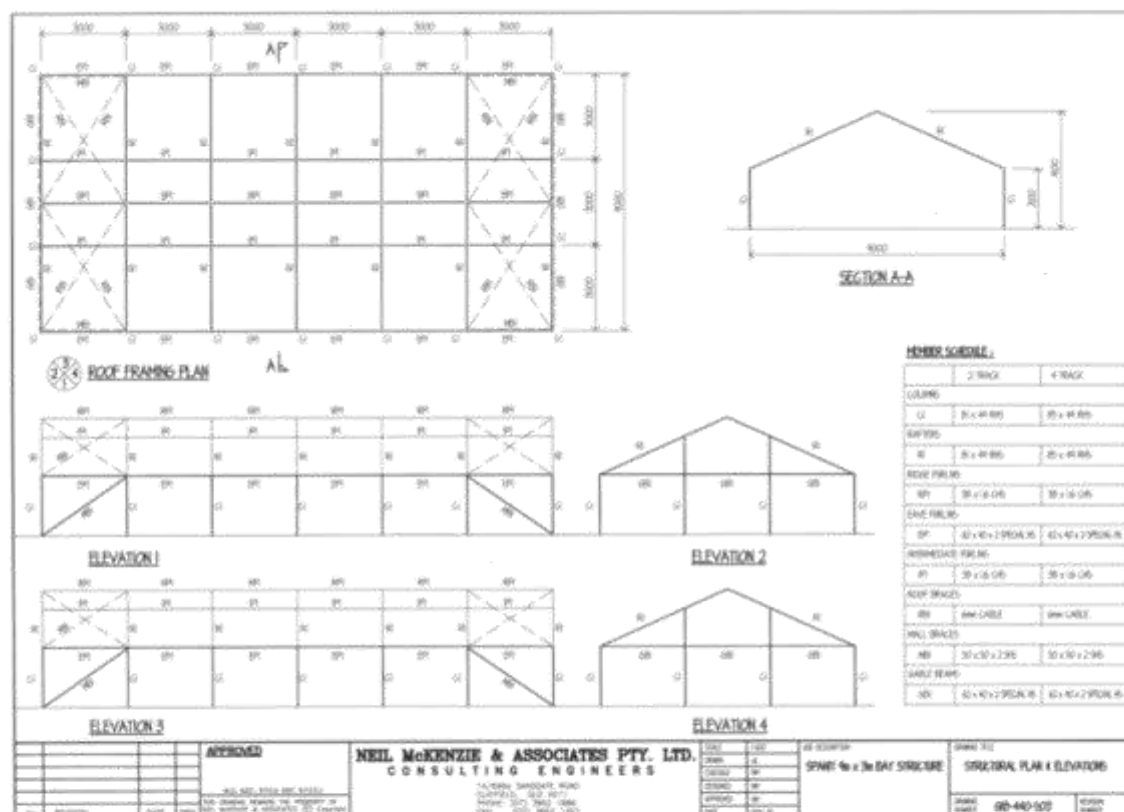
Structural Plan & Elevations (Source: Neil McKenzie & Associates Pty Ltd Consulting Engineers, November 2021)
